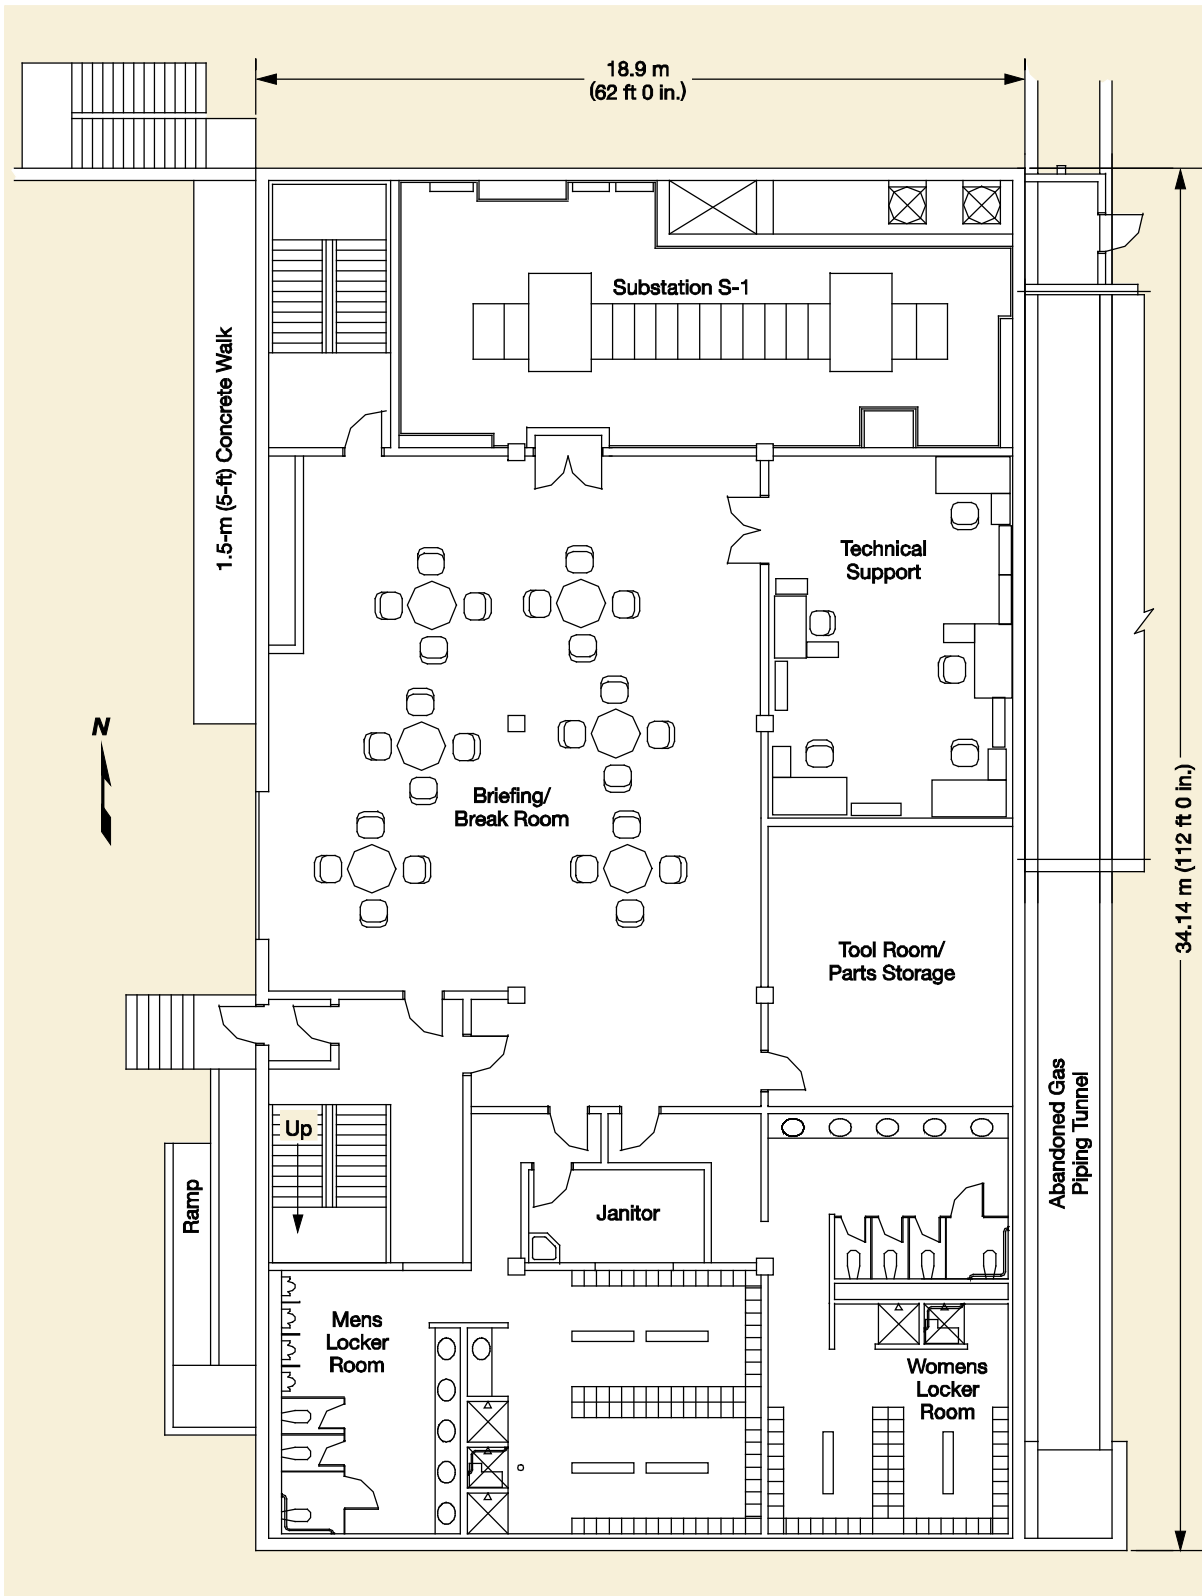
Support Equipment Building (SEB) (Building 395) Second Floor Plan
